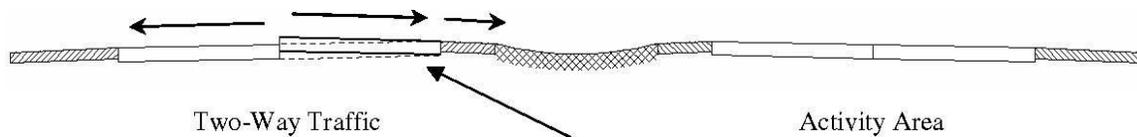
Desirably Superelevated Cross-Section for Crossover Exit
